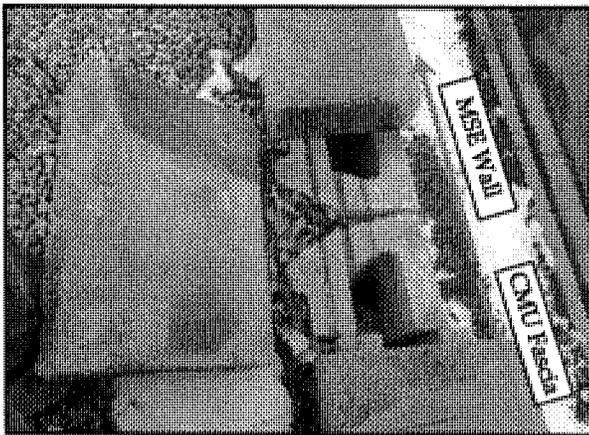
Capstone removed at construction joint between MSE wall and CMU fascia wall
